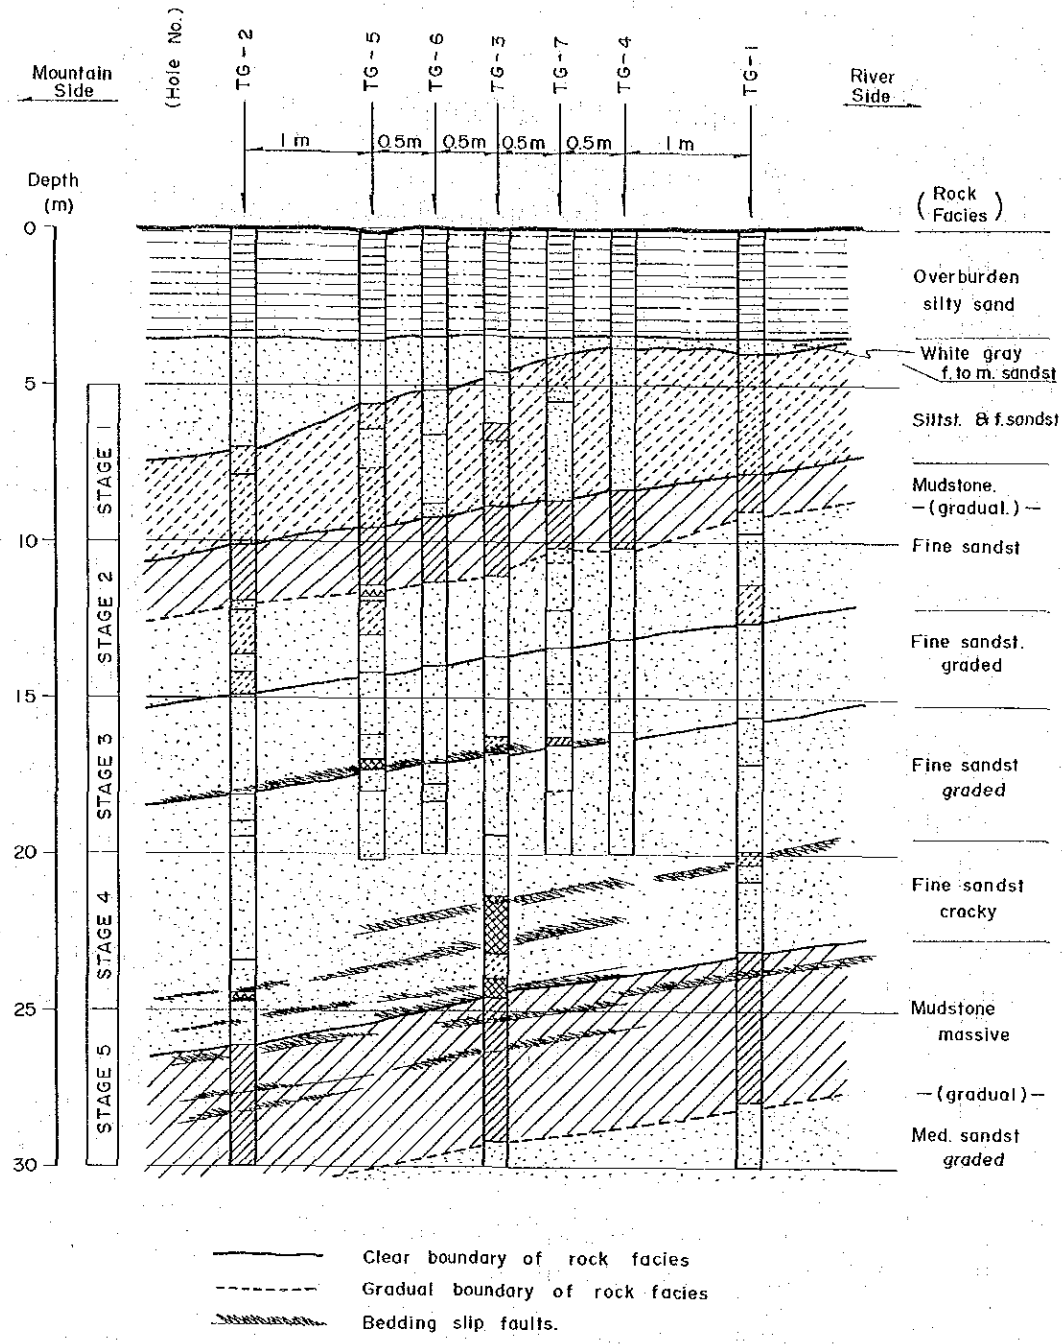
GEOLOGIC SECTION OF THE TEST GROUT SITE
